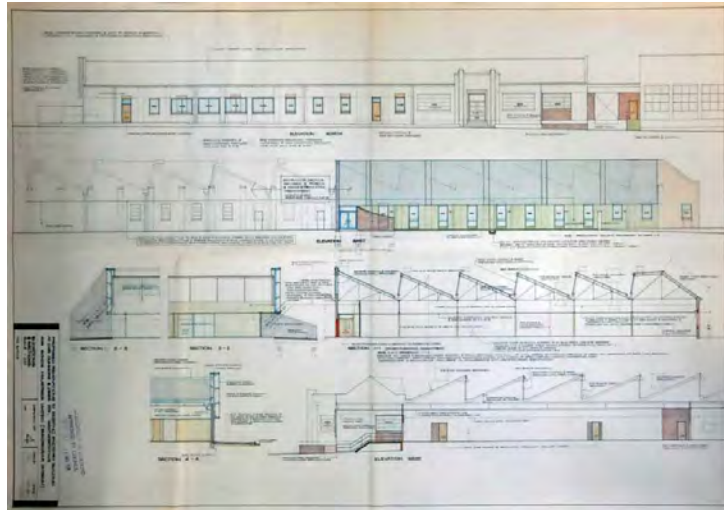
Drawing showing proposed alterations to the Administration Building, 1988. (Source: Pacific Brands plan room)
